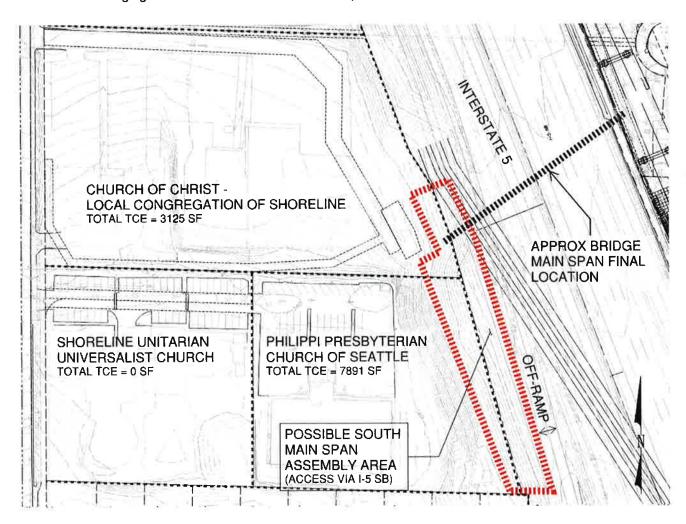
Potential Bridge Construction Staging Area Adjacent to the Philippi Church Parcel
